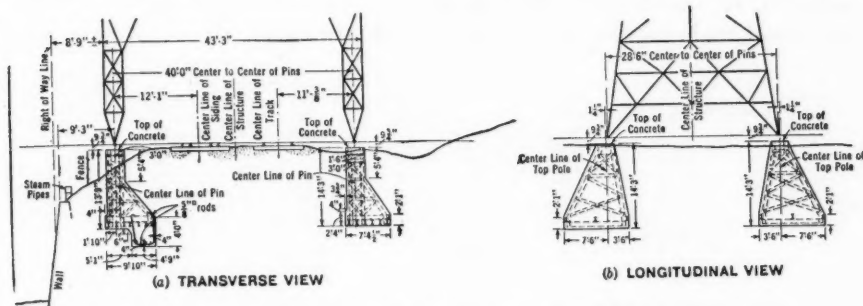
FOOTINGS REVERSED TO SUIT SPECIAL RIGHT-OF-WAY CONDITIONS.
